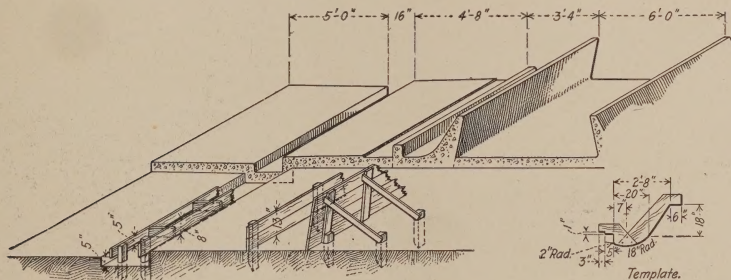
Detail of forms for cow barn floors, gutters and mangers. Notice that gutters and mangers are constructed first and the floor in between afterward.
